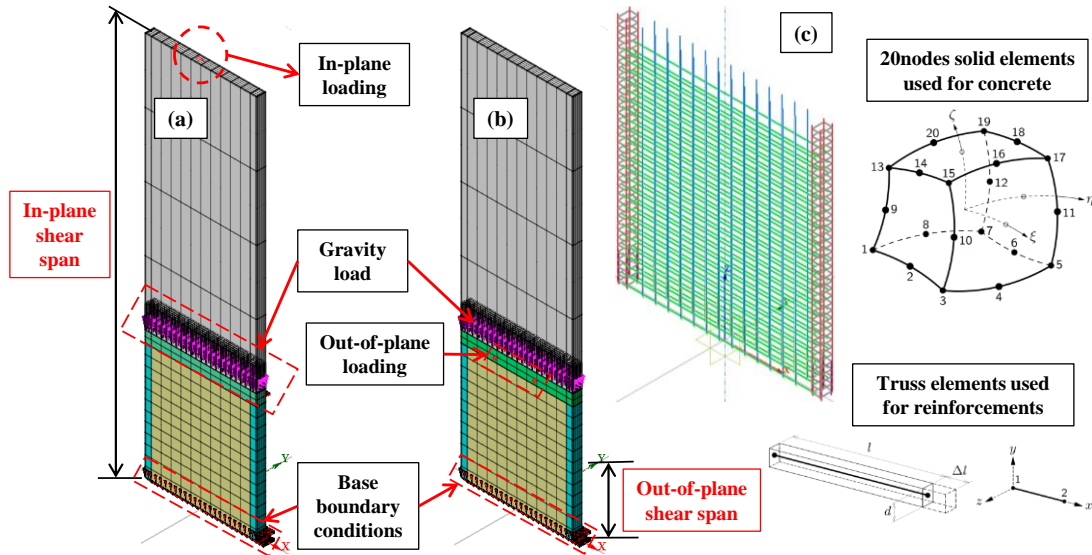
FE model of wall D5-6 in DIANA when under (a) in-plane uni-directional and (b) out-of-plane uni-directional loadings and (c) details of the reinforcements and elements used in the FE model
